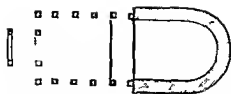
Plan of Chaitya-Hall, Sanchi (Fergusson)
